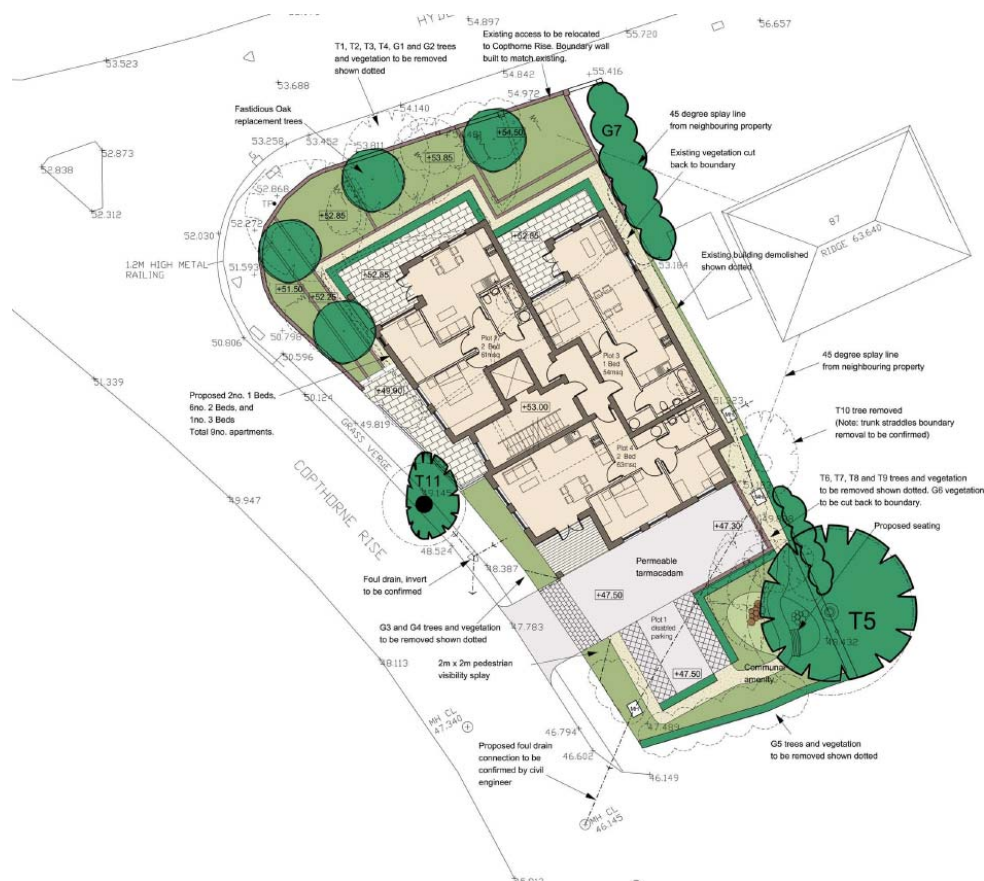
Site Plan (Ground Floor) in relation to no.87 Hyde Road
